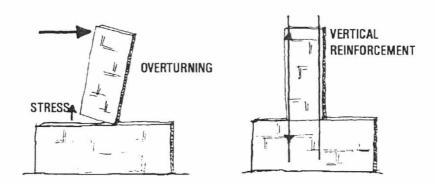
TOPPLING OVER OF SMALL WALL SECTIONS AND NEED FOR VERTICAL REINFORCEMENT
